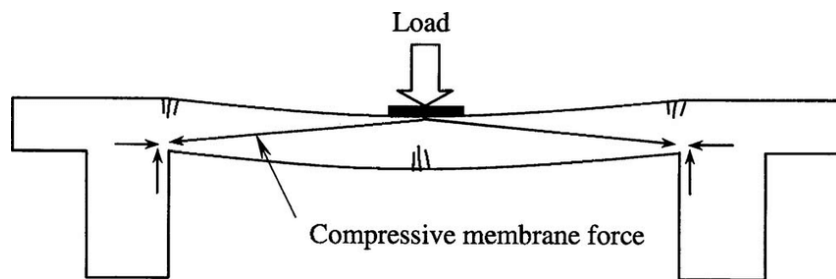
Visual representation of CMA in both concrete deck and girders [19]
